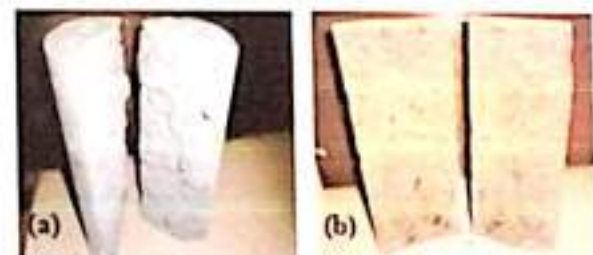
(a) Failure form of splitting tensile force at concrete cylinder made of new cement; and (b) failure form of splitting tensile force at concrete cylinder made of Portland cement.
